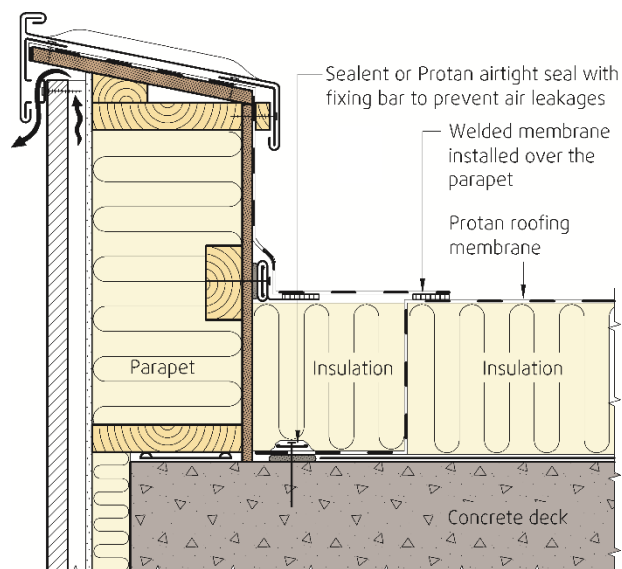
Sealing principle for edges on a roof with an airtight concrete deck. New building. Suitable if movements are expected between the wall and the deck.
